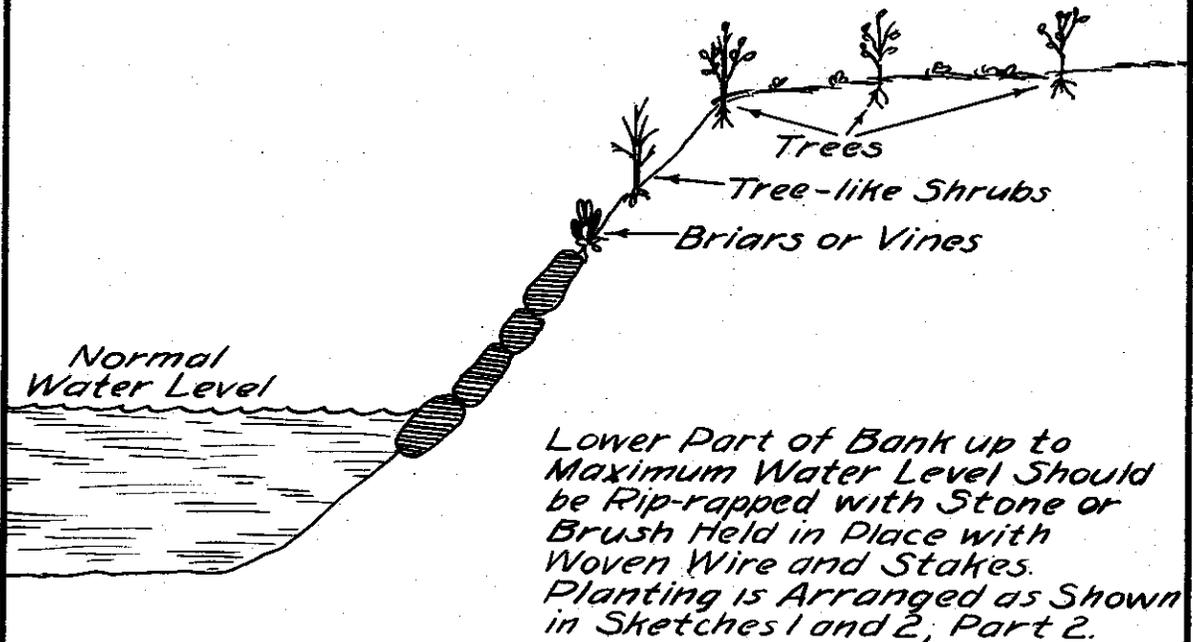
, page 169, Brush Matting or Rip-rap Reinforced by Planting.
